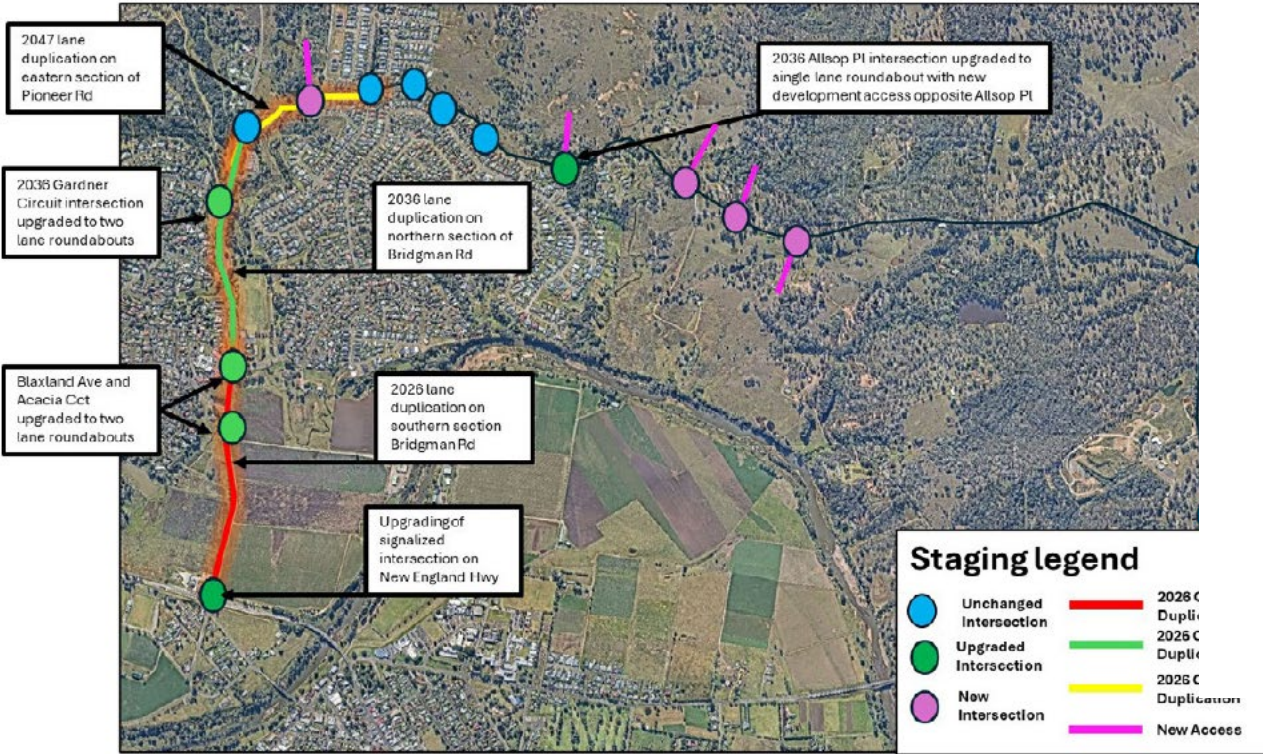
Bridgman Road and Pioneer Road upgrades staging plan Bridgman or Pioneer roads
